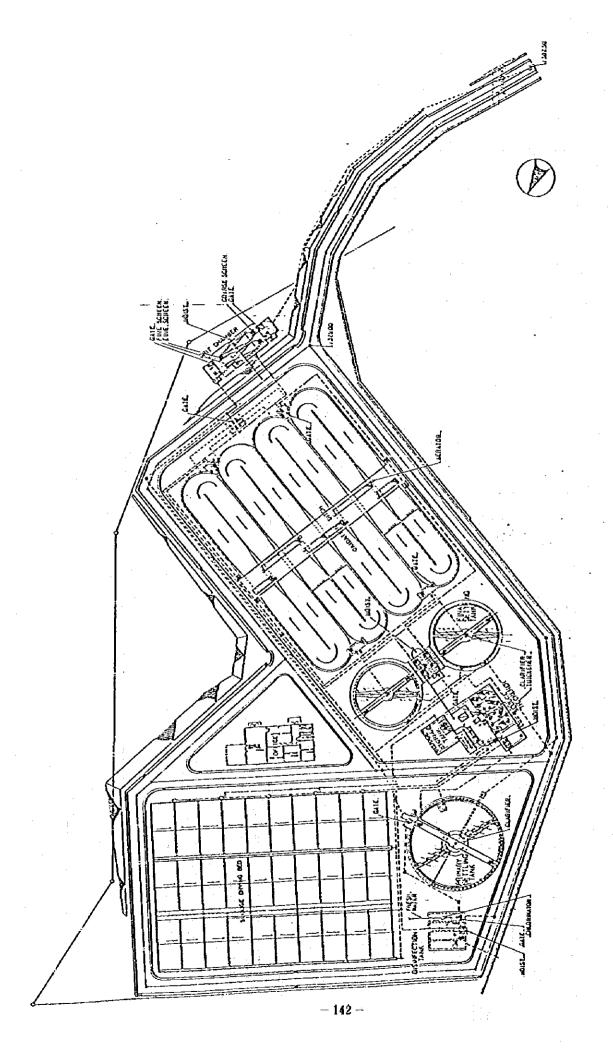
Mechanical Equipment Layout Plan (1)-1 (Horizontal Aerator)
